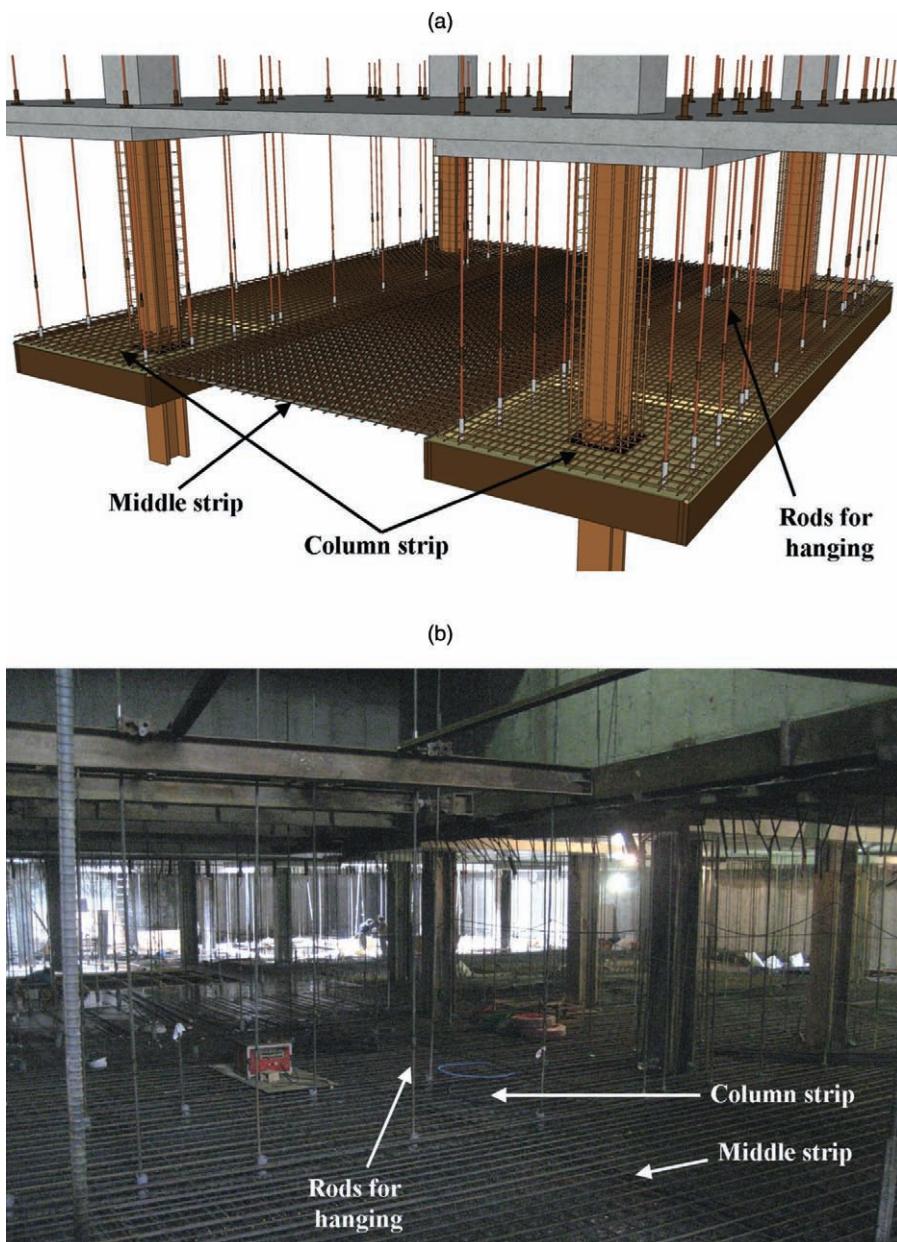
Placement of rebar. (a)–(b) Two-way placement of rebar
